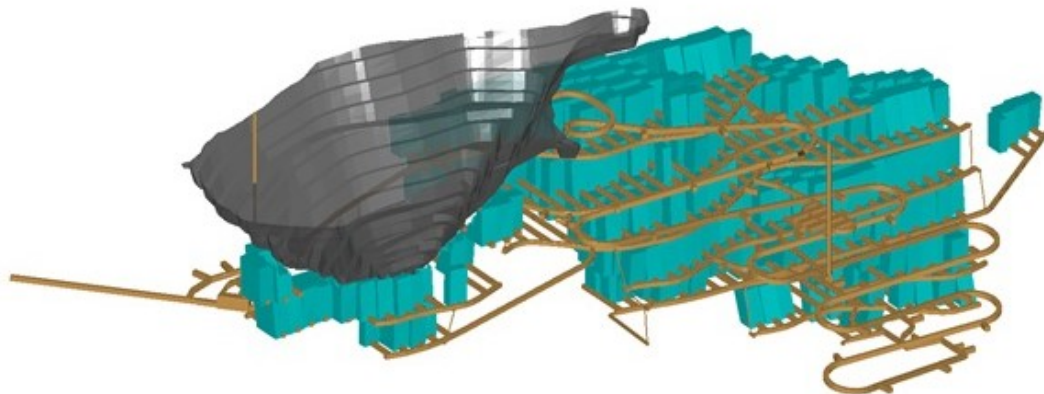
Open Pit and Underground Mining 3D Model – South-West
